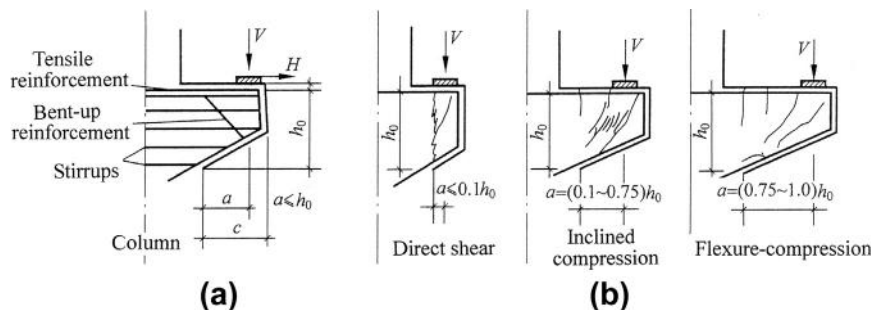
Detail and failure patterns of bracket: (a) general detail, (b) failure patterns [14-18]
